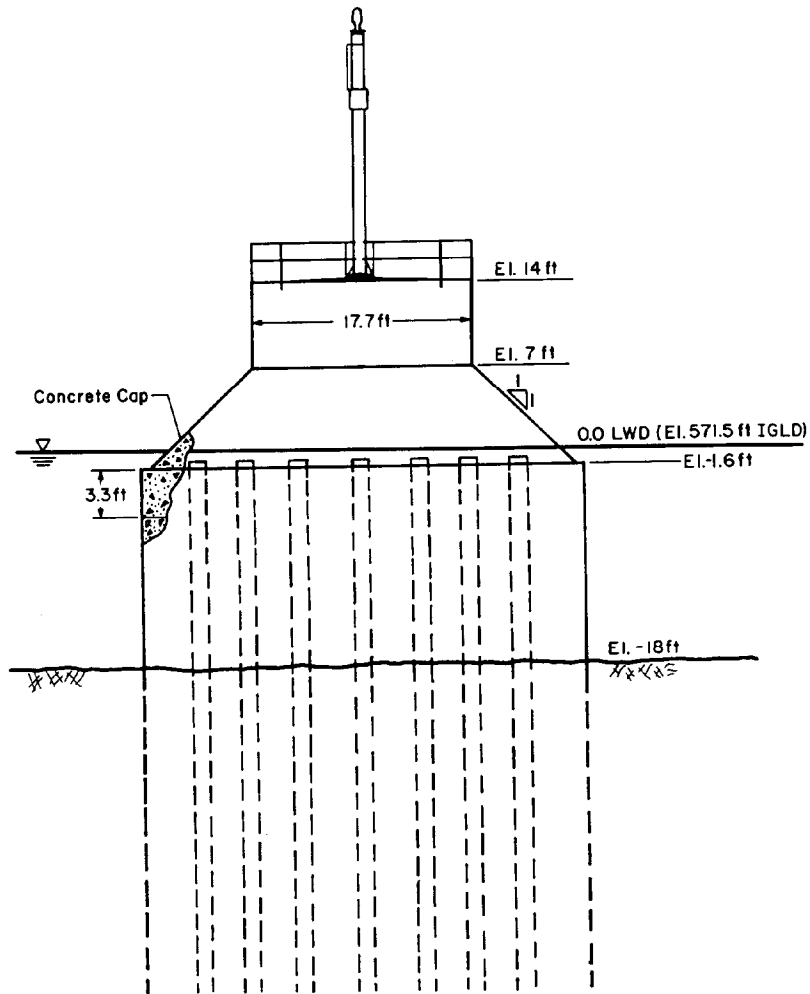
Light pier in Lake St. Clair, Michigan.
